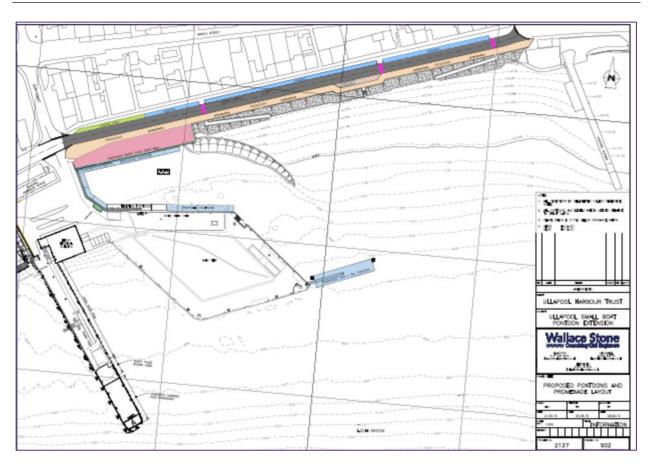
Layout of proposed promenade at Shore Street and enlarged small boat facilities at Ullapool Harbour
